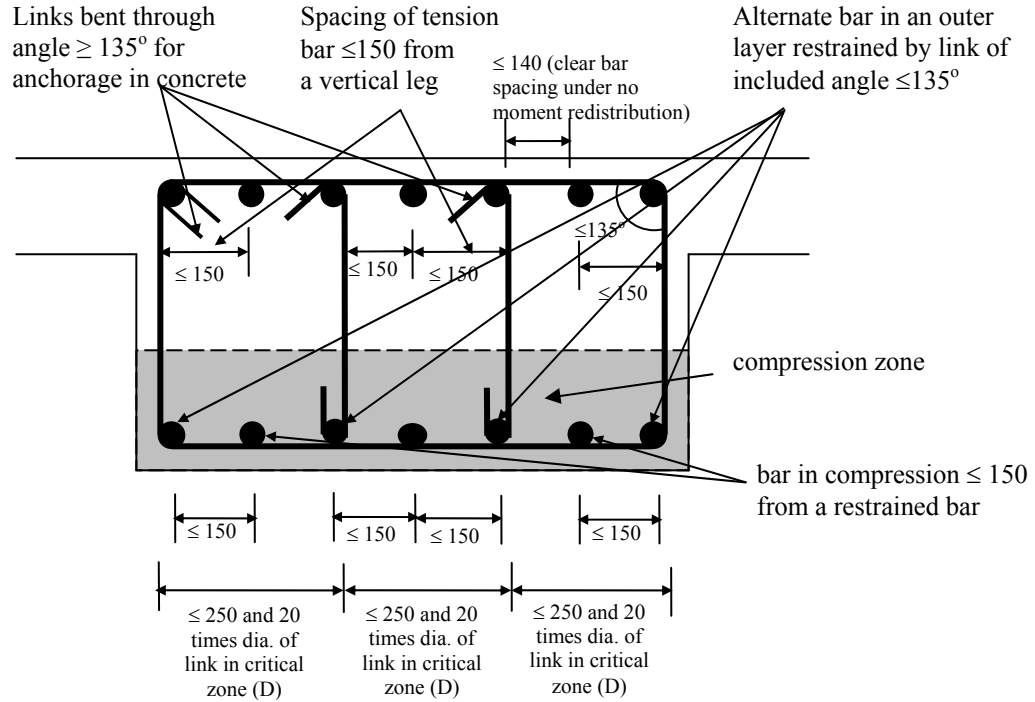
Anchorage of Longitudinal Bar in Beam Section
